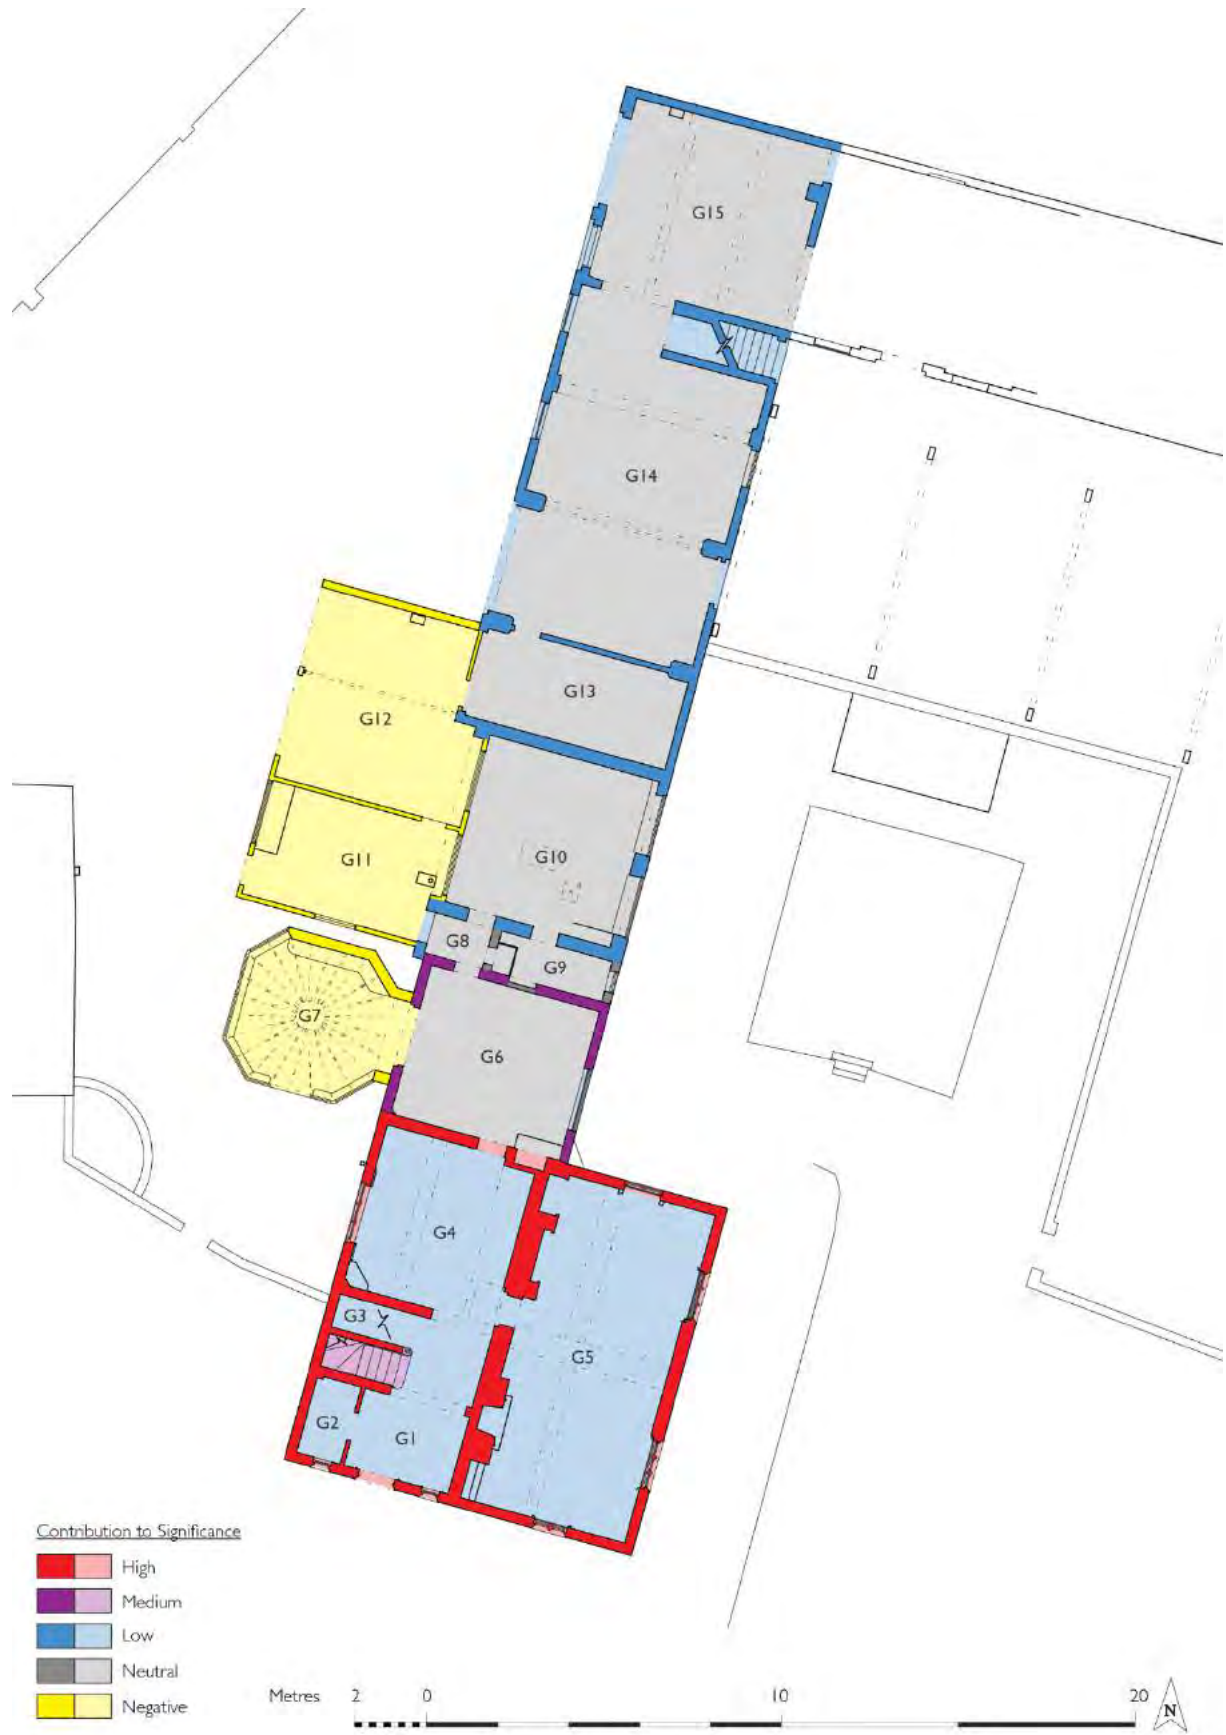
Ground floor plan showing contribution to significance (Buildings 1-4)
